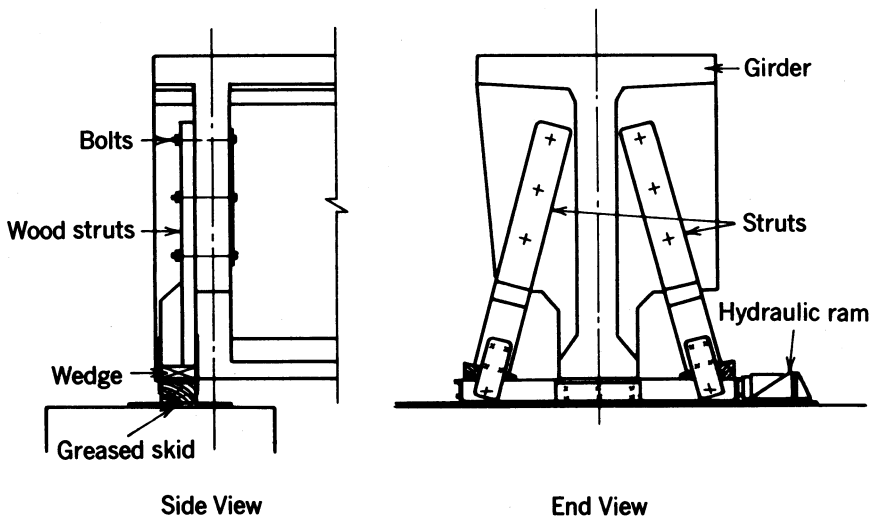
Bamako Bridge apparatus for transverse sliding of girder.
